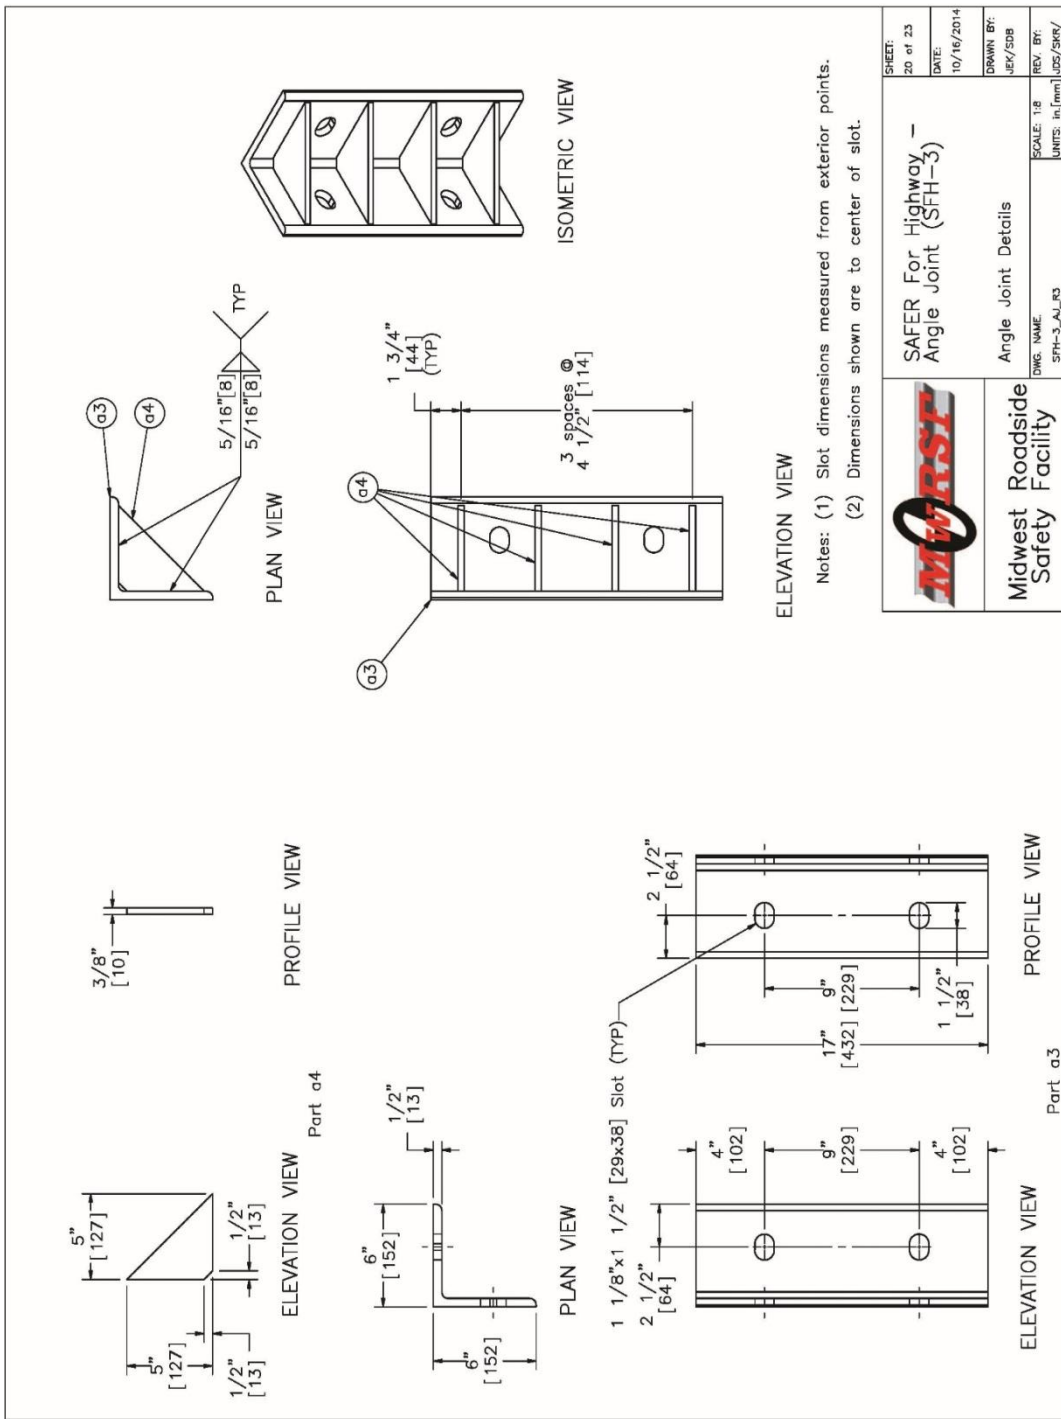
Angle Joint Details, RESTORE Barrier [20]
